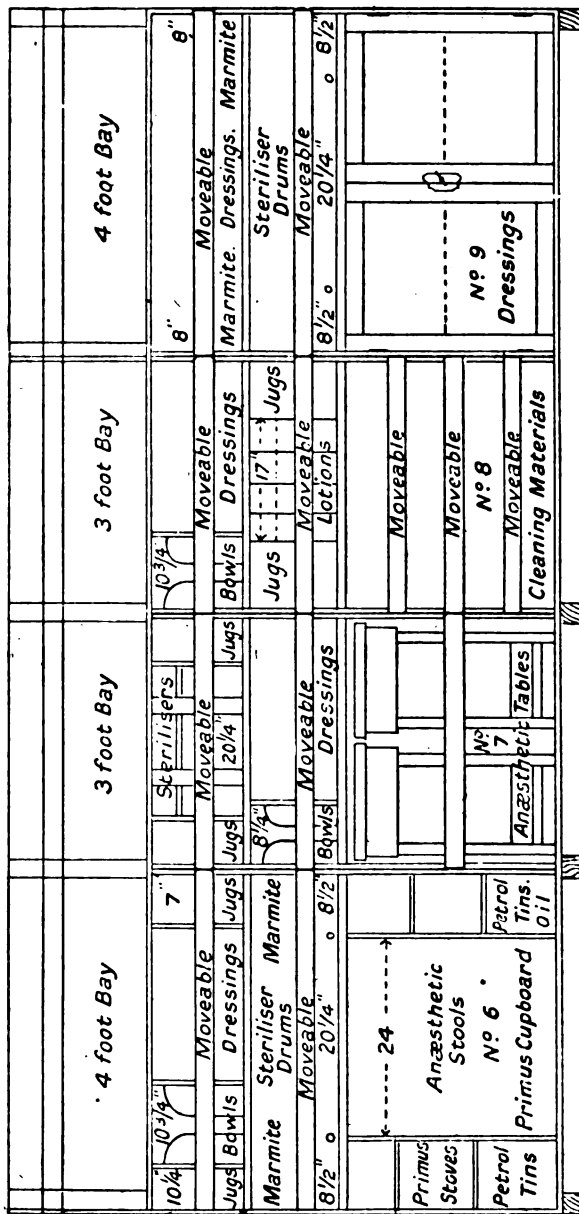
Longitudinal Section, right-hand side. (Compare with photograph, fig. 4.)
